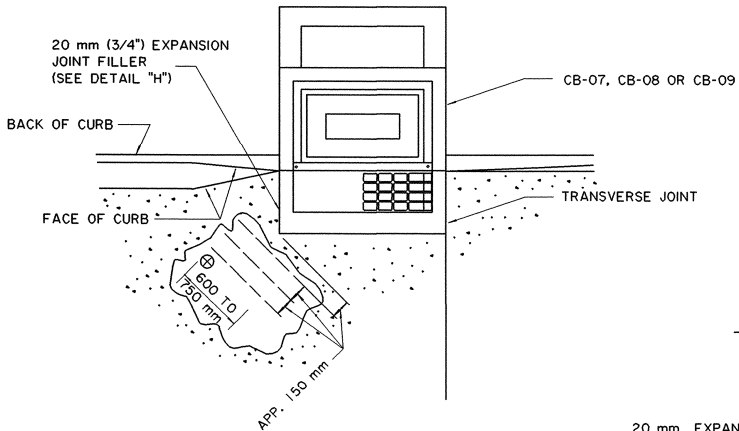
DETAIL SHOWING JOINTS IN CONCRETE CURB AND GUTTER
